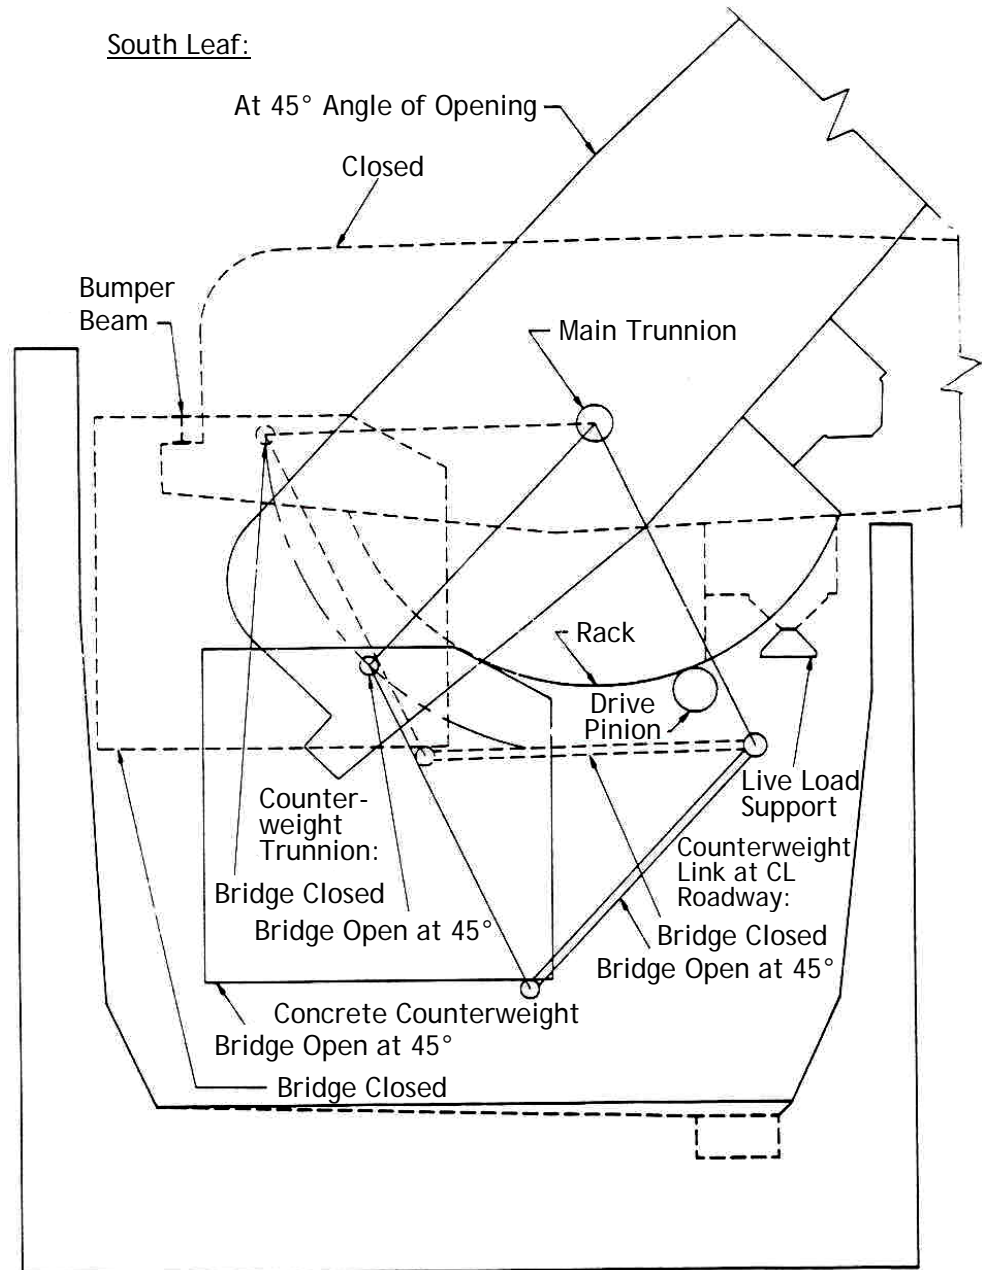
Multi-Trunnion, Strauss Type Bascule Bridge
